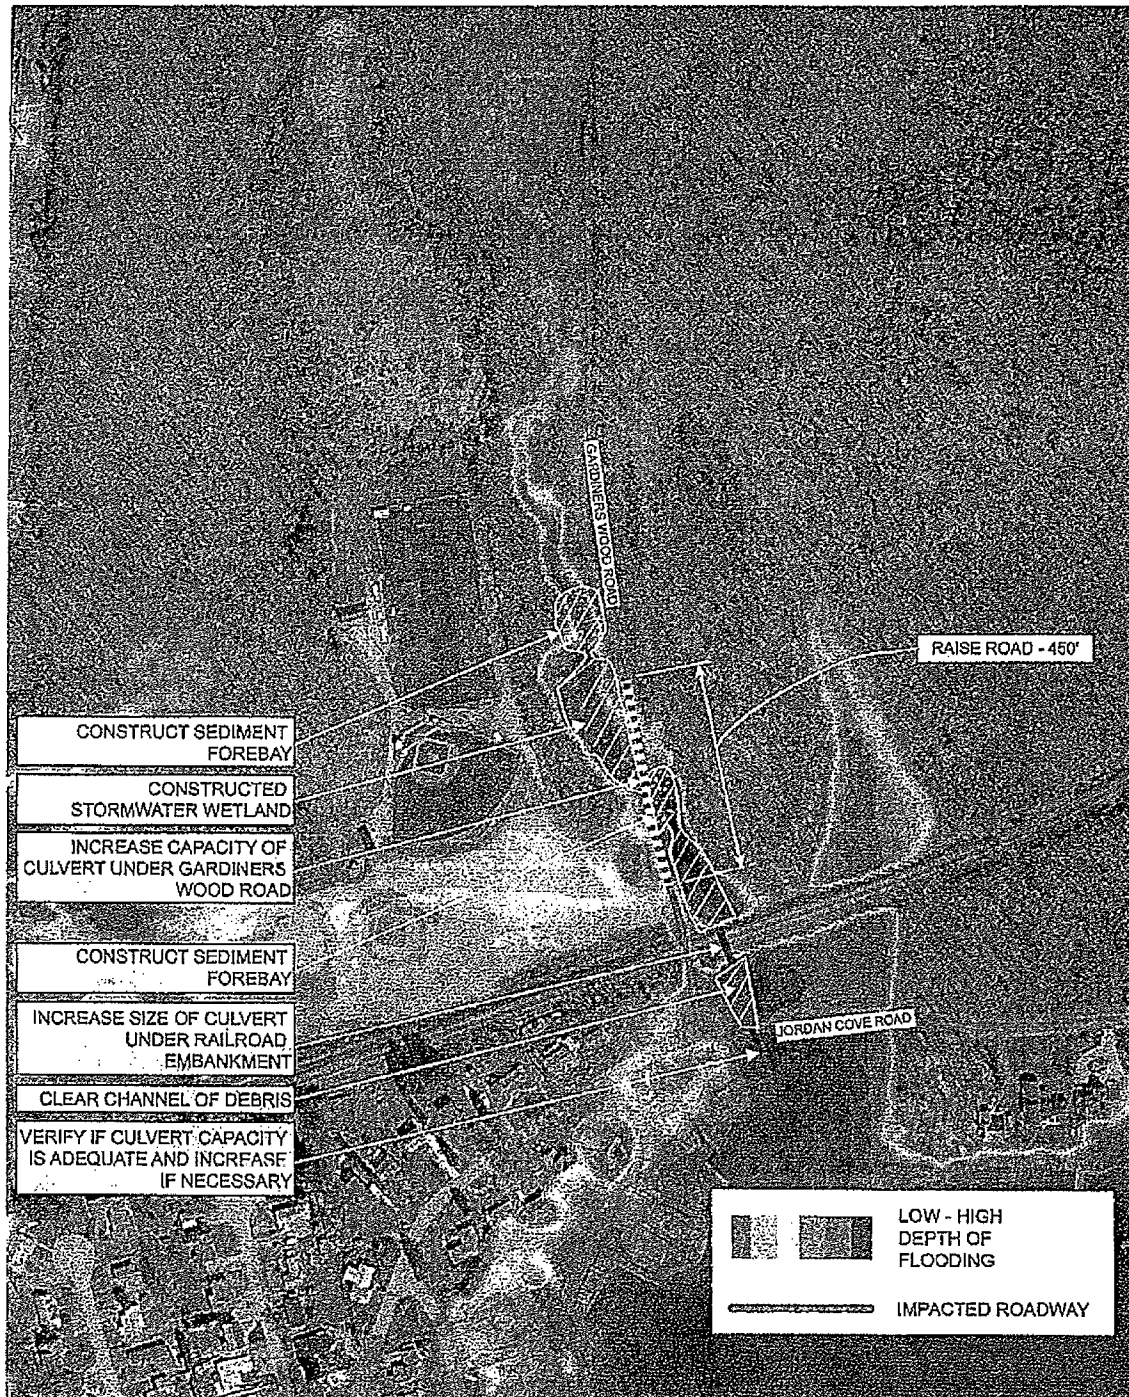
Gardiners Wood Road Adaptation Strategy No. 1 - 2070, 100-Year Coastal Flood Scenario
